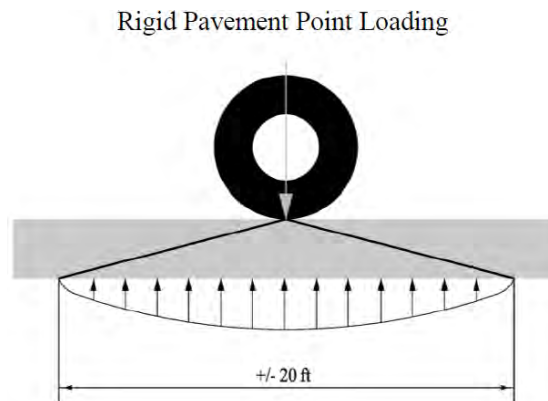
Loading type in the study of concrete pavement in ASSHTO 1993 [1], [75].
